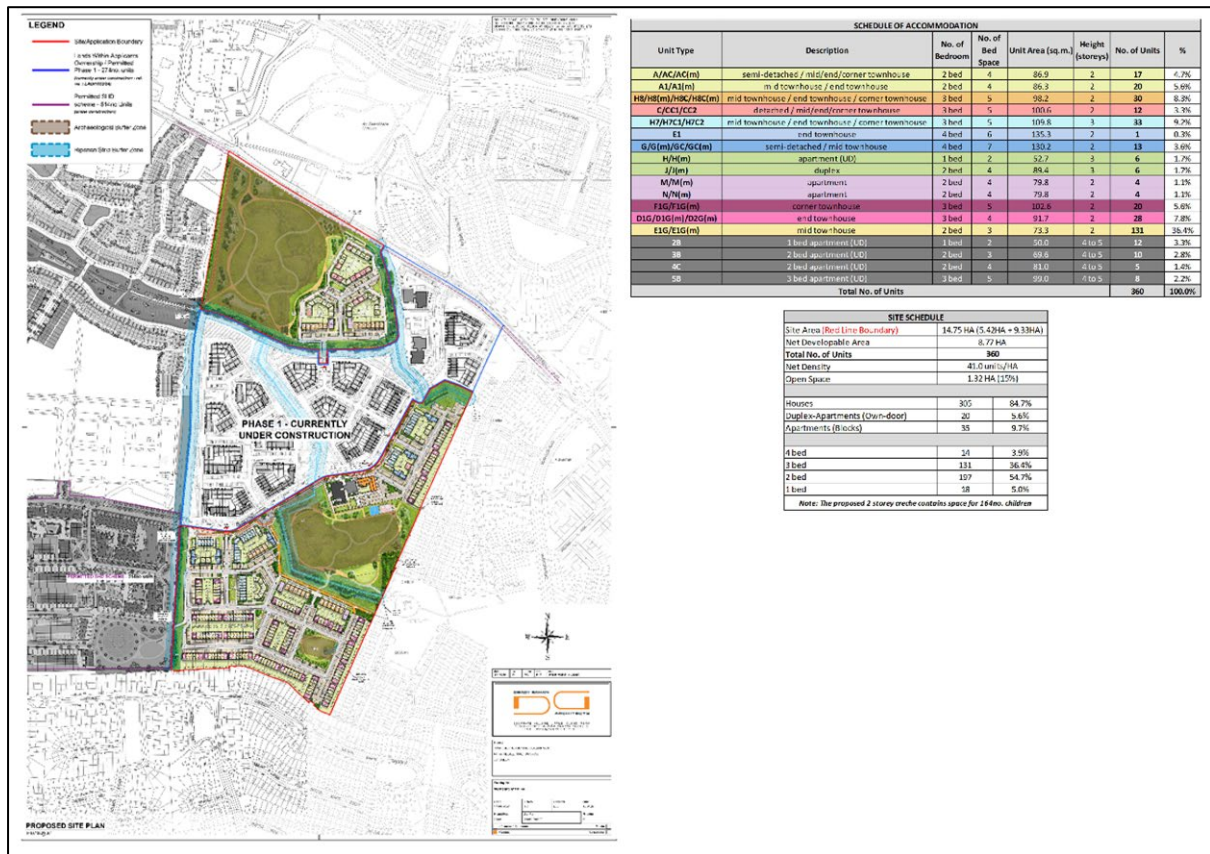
Site Layout DwG no. 23068_P_003E Proposed Site Plan (DG Architects, 2026)
